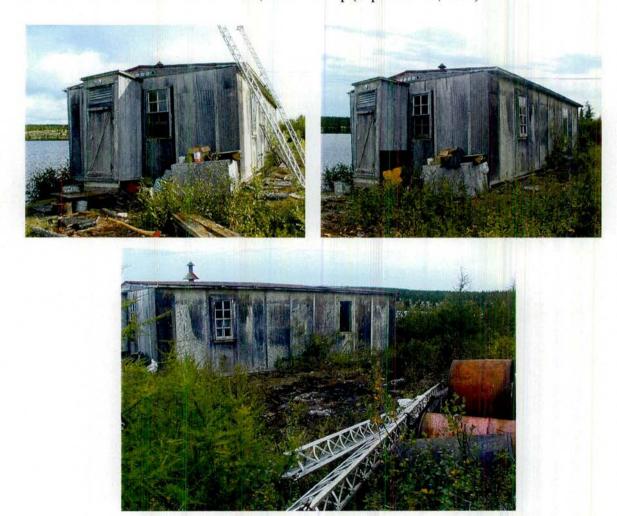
View of a building at Site 330A: before (top left) and after clean-up (two other photos) in September 2000.
